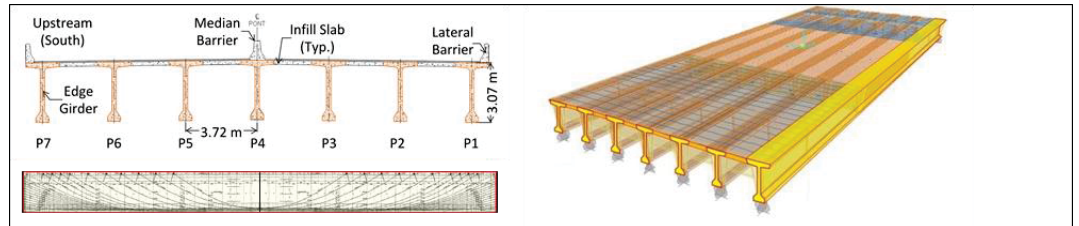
Typical Section 5 and 7 Concrete Span Deck Cross-Section and Elevation of Girder Internal Post-Tensioning System
